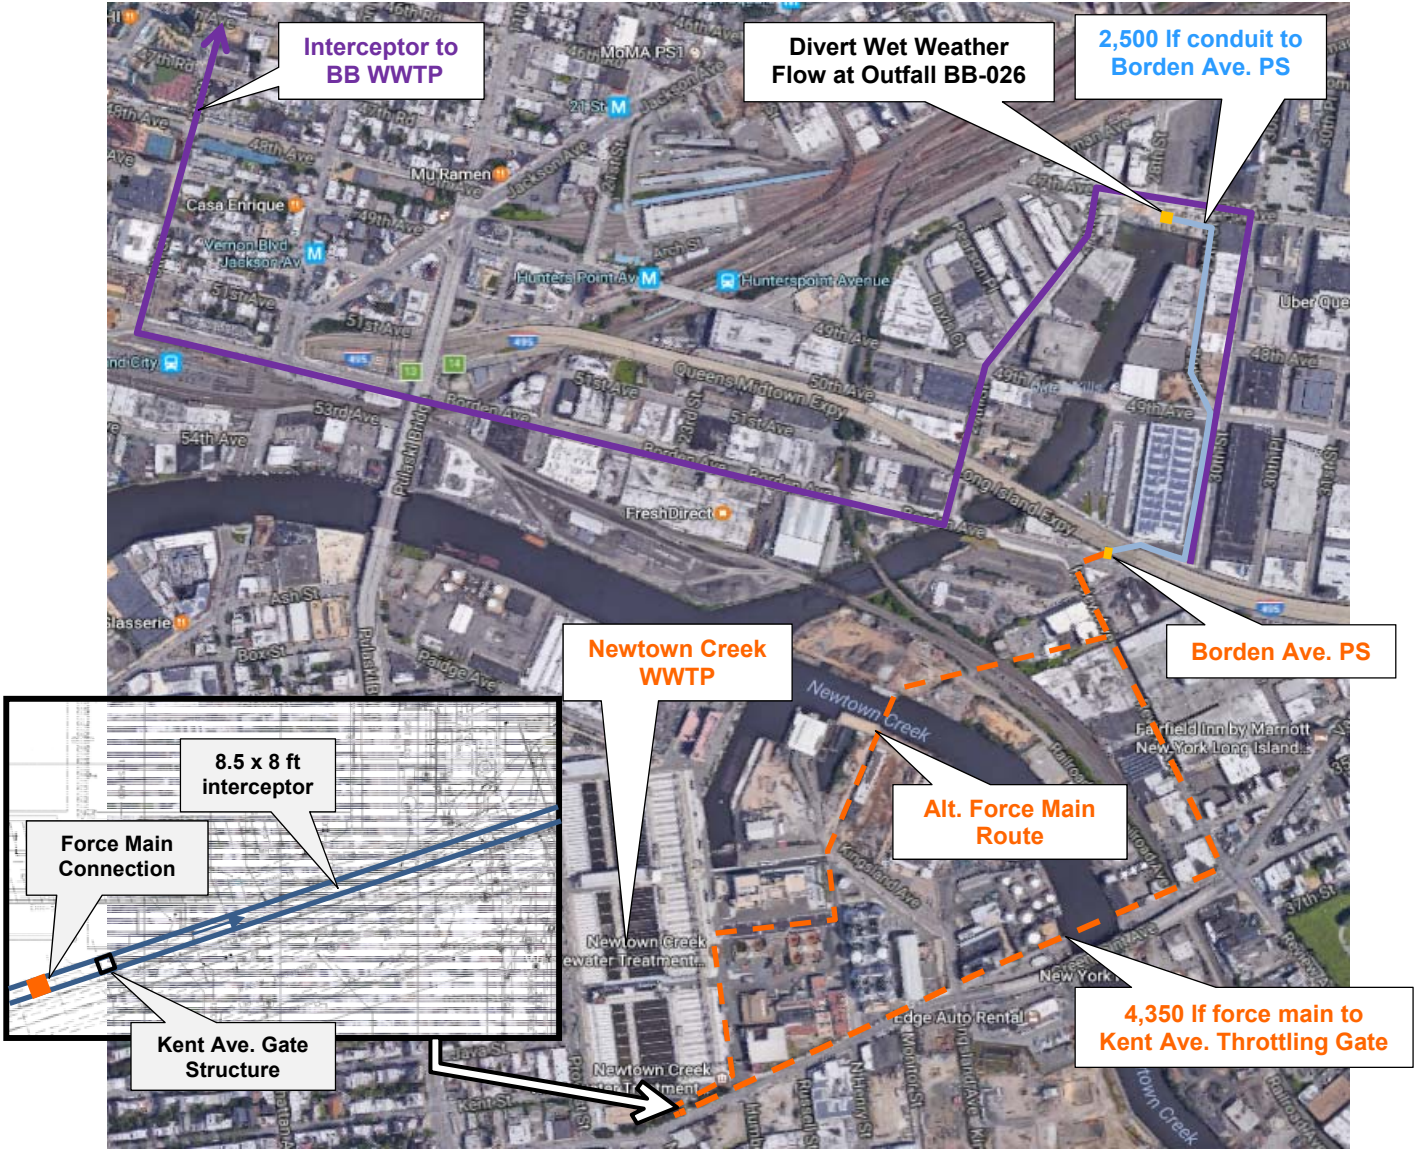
Borden Avenue Pump Station Upgrade/Expansion Layout
